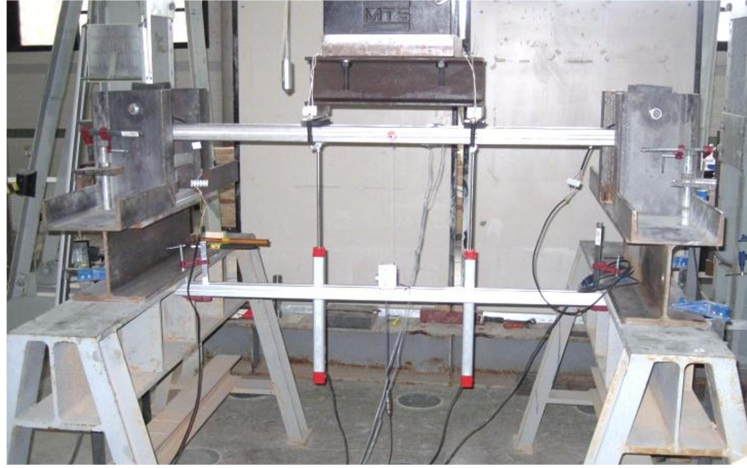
Test arrangement for the 4-point bending test (4P) – Specimen 80×40×2-4P-Mi
